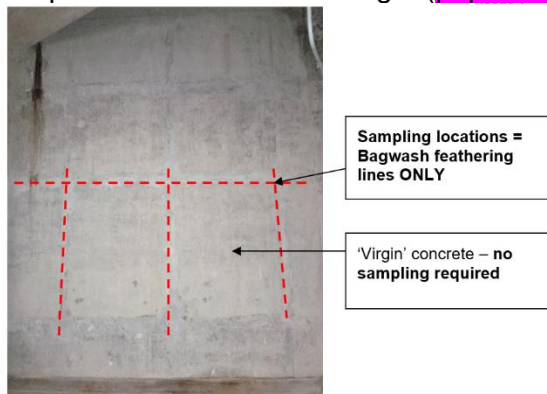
Full elevation of reinforce concrete (example of bagwash sampling lines)
